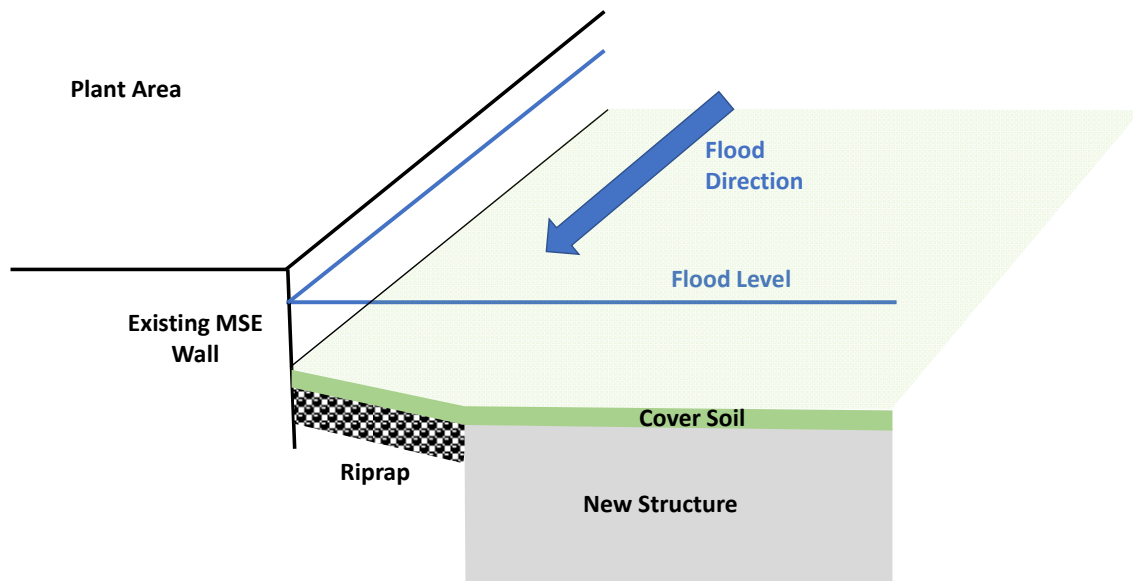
3-foot thick rip-rap zone between structure back and existing wall
